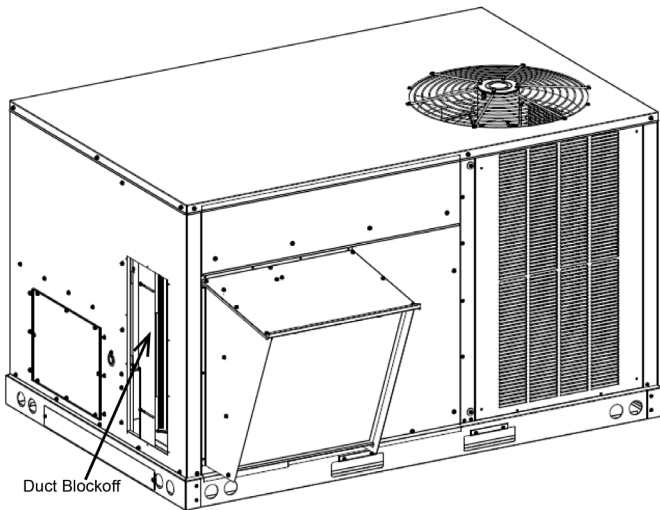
FULLY ASSEMBLED ECONOMIZER
